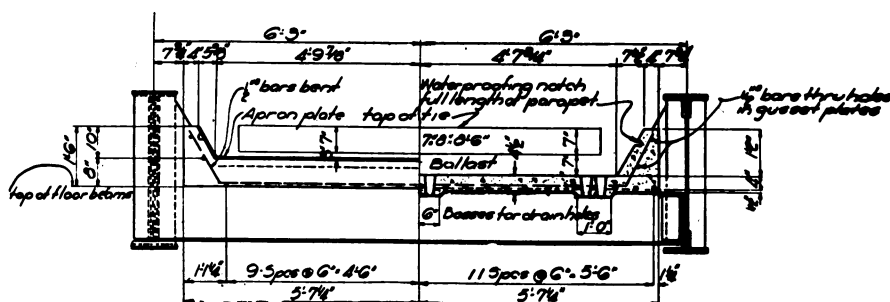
LEAVING A SPACE BETWEEN THE WEB AND END OF DECK ELIMINATES A TROUBLESOME JOINT.
